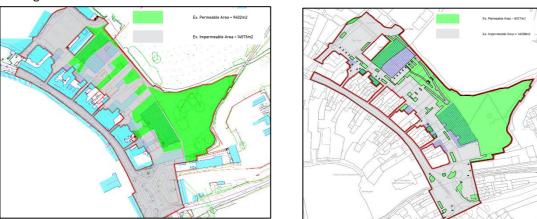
Existing and Proposed Permeable and Impermeable areas
